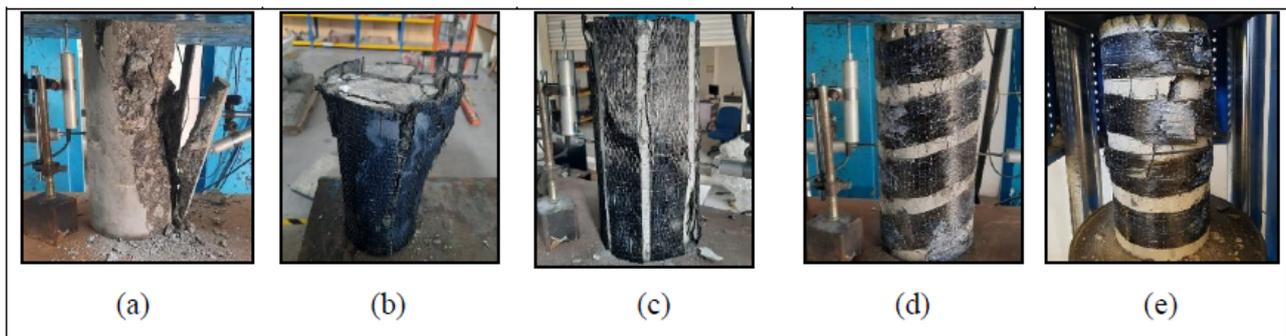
The crack pattern of cylinder specimen; (a) UC (b) C (c) V (d) I (e) H
